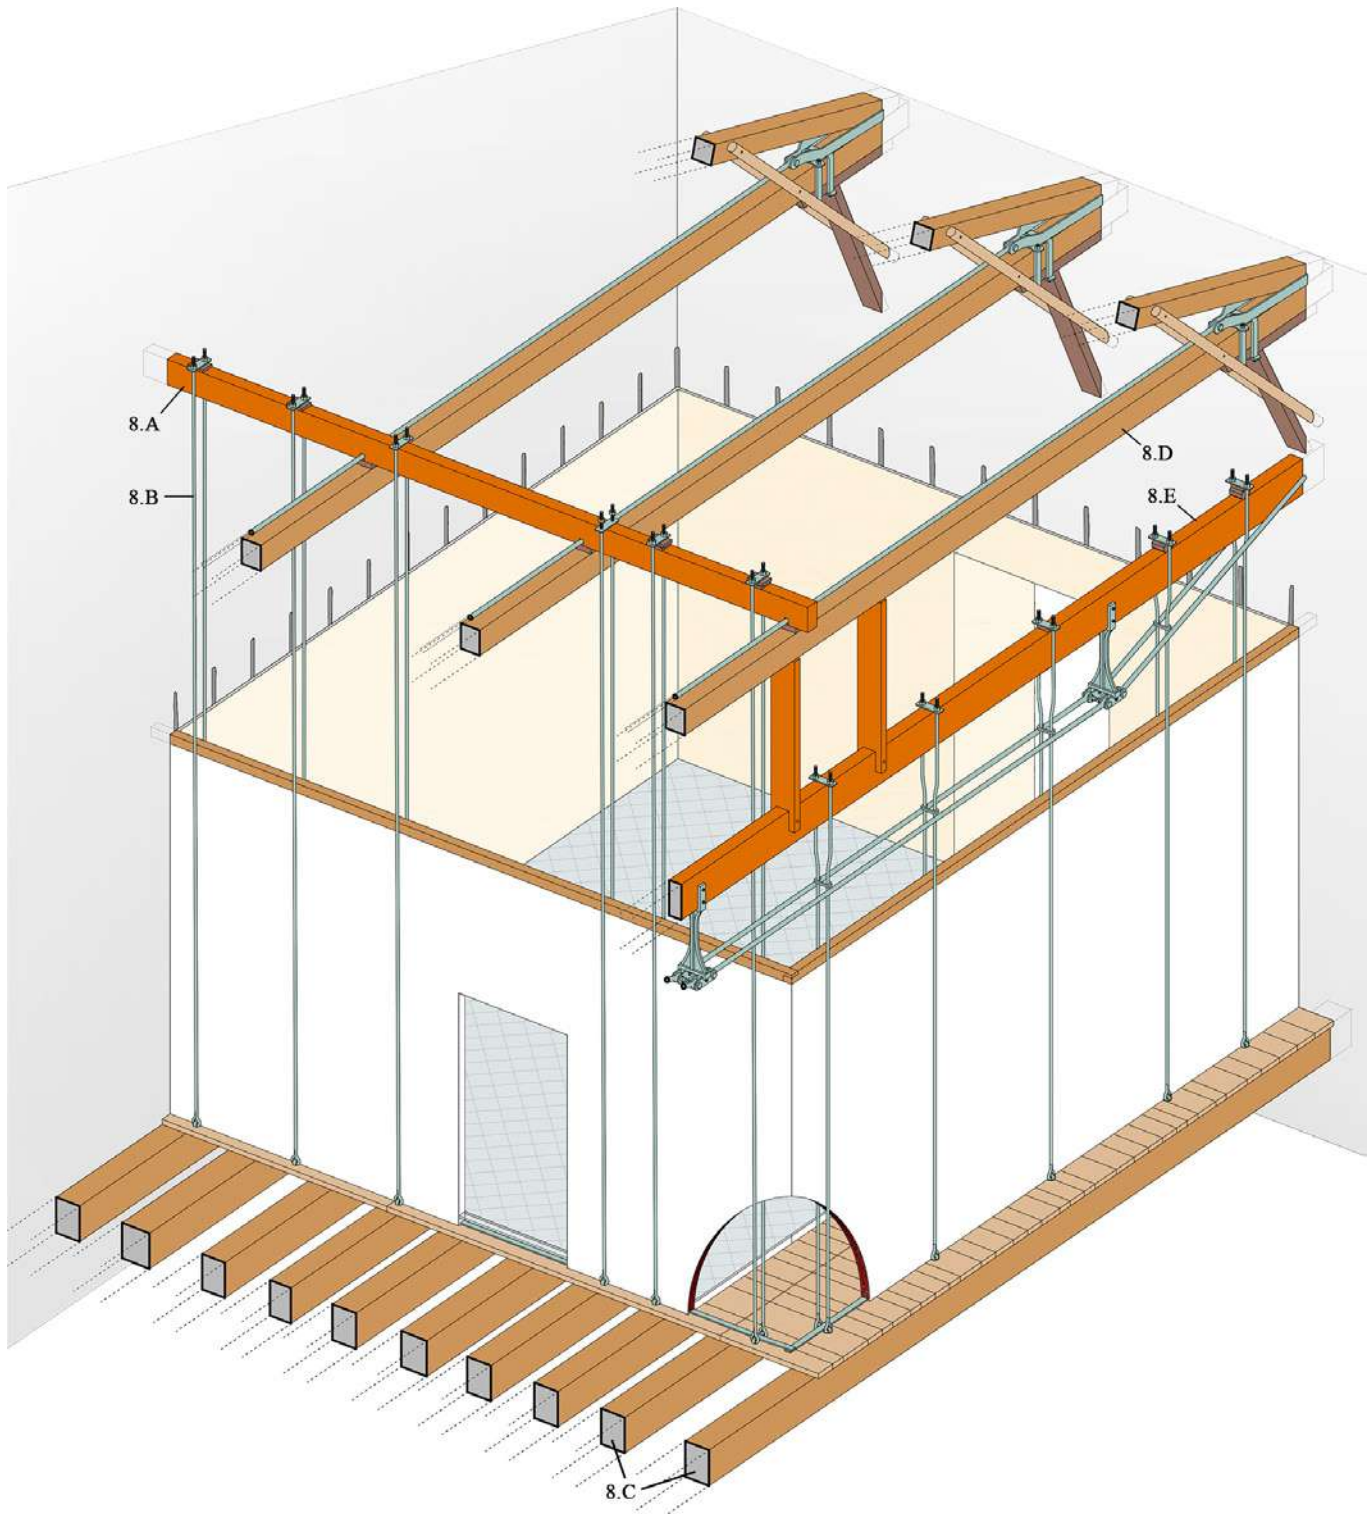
Scheme of the system used to suspend the thin-tile brick walls from the roof trusses.
